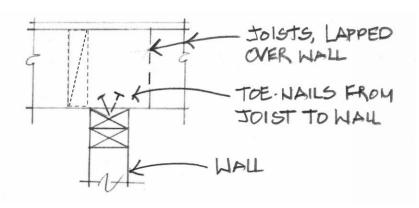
Toe-nails fastening the second-floor joists to the Line 3 first-story wall.
